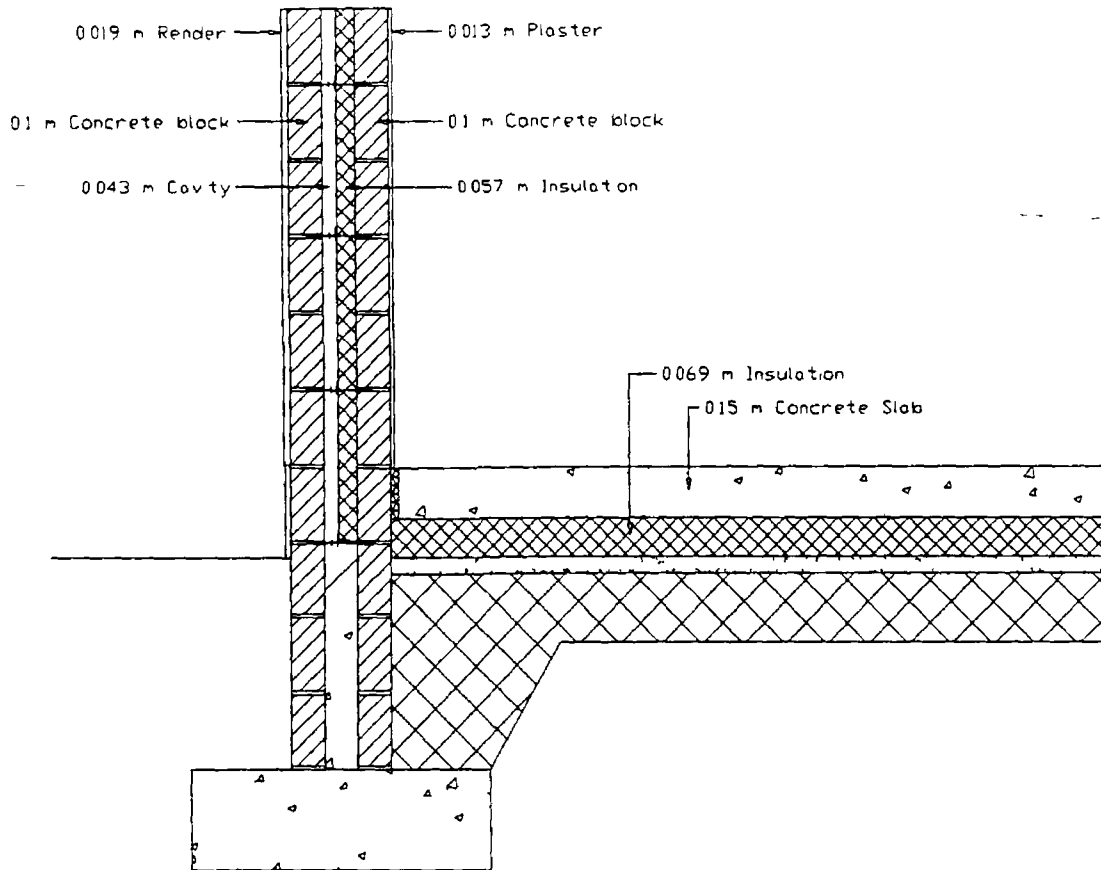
Bungalow Foundation, Floor and External Wall
